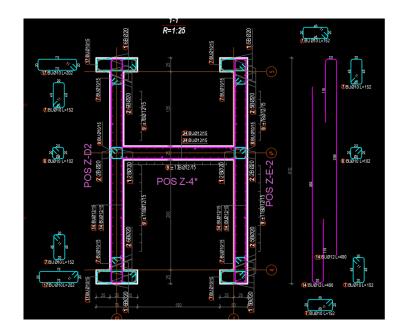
AutoCAD Reinforcement of Elevator Walls
